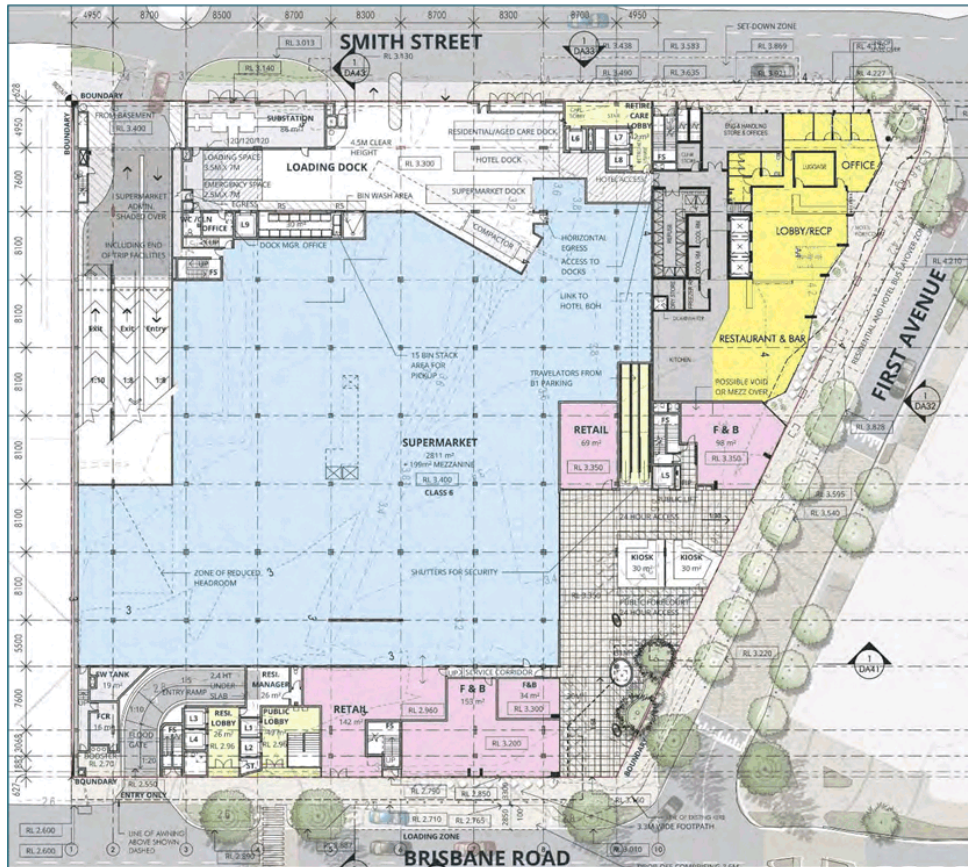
Ground Floor Plan of Development (Drawing 10630 DA11 Issue 8)
